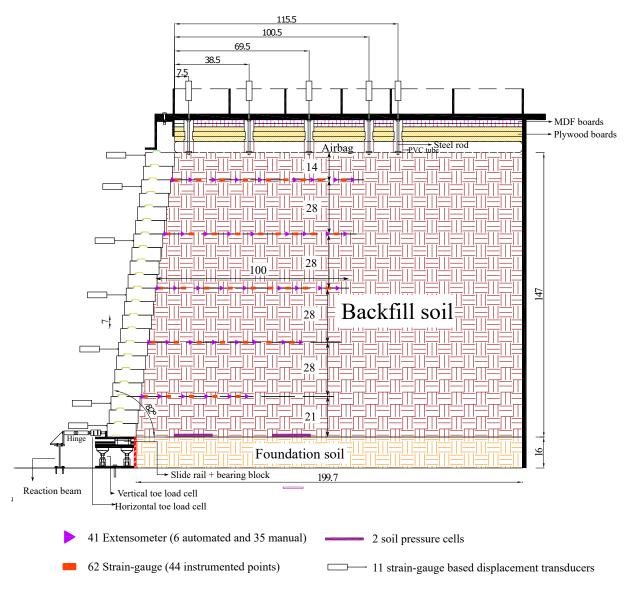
Cross-section view showing general schematic of the reduced scale reinforced soil model and instrumentation (dimensions in cm).
